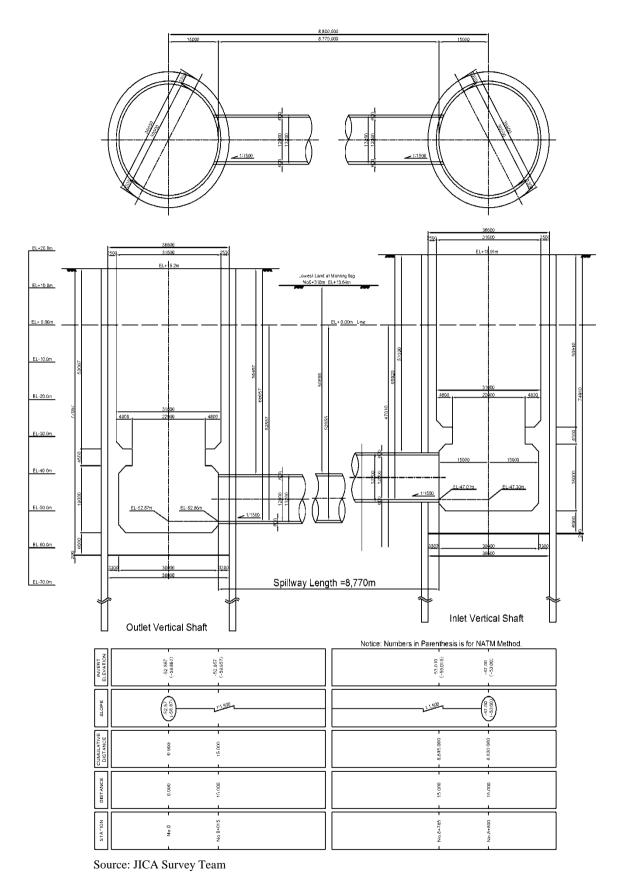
Plan Drawing of Vertical Shaft of Inlet and Outlet
